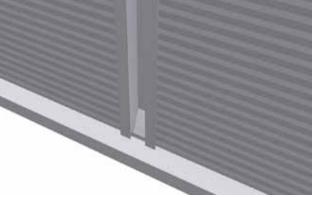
Stages of assembling the drainage channel for K175 Top-hat dressing - assembly of K255 dressing.
